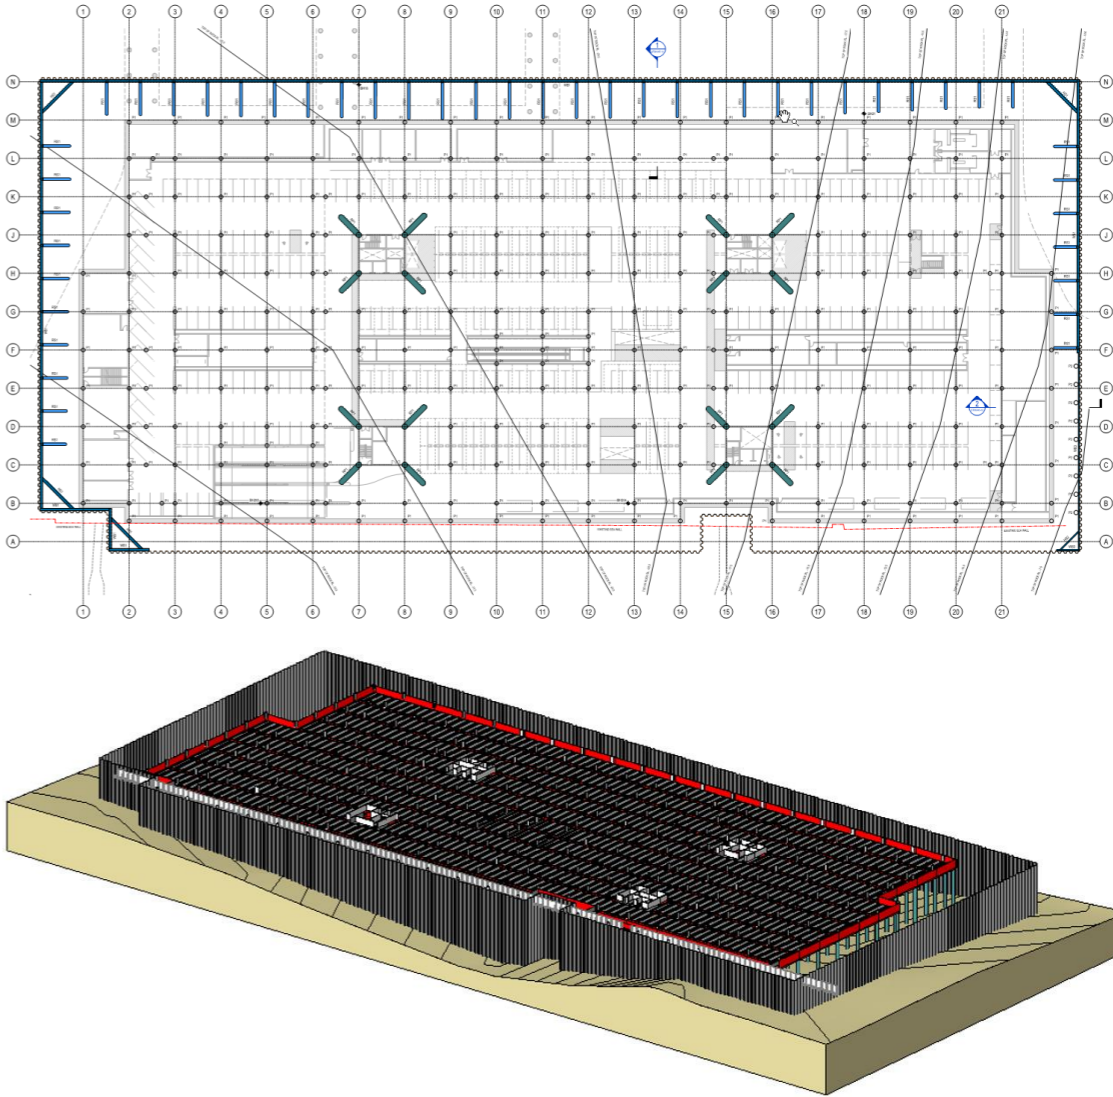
Plan & 3D view showing extent of sheet pile wall
